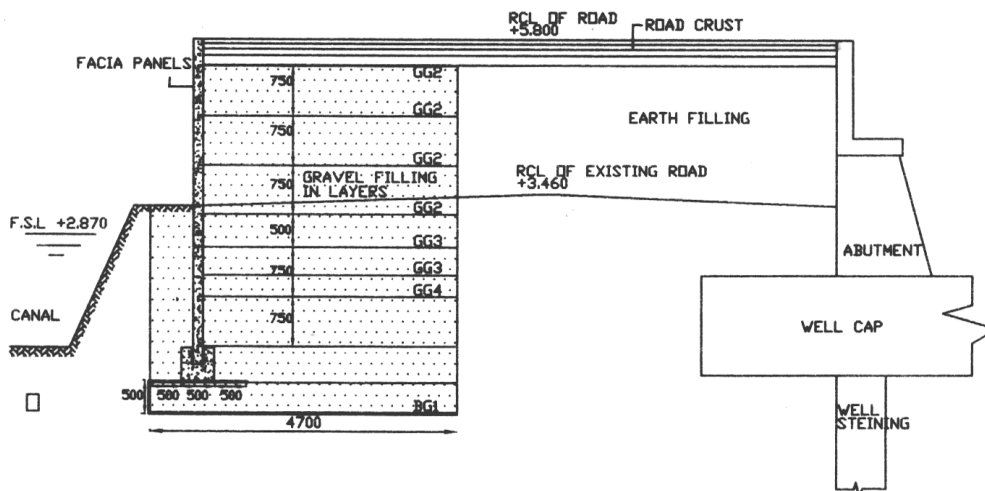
Sectional view of geosynthetics reinforced soil wall at Bhimavaram – Losari road
